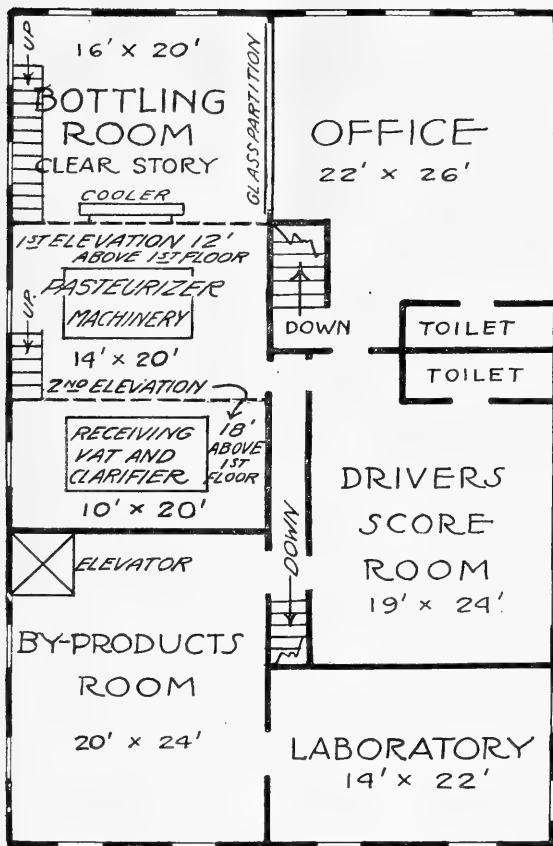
A.—Second-floor plan for a two-story plant of from 2,000 to 3,000 gallons' daily capacity.
